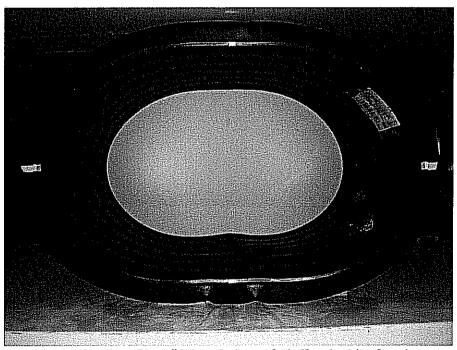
Test Pipe #3 Loaded to 30% Vertical Deflection
